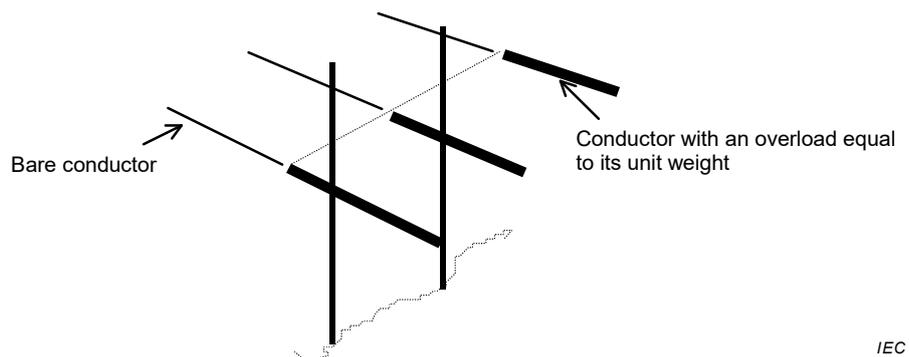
Simulated longitudinal conductor load (case of a single circuit support)
